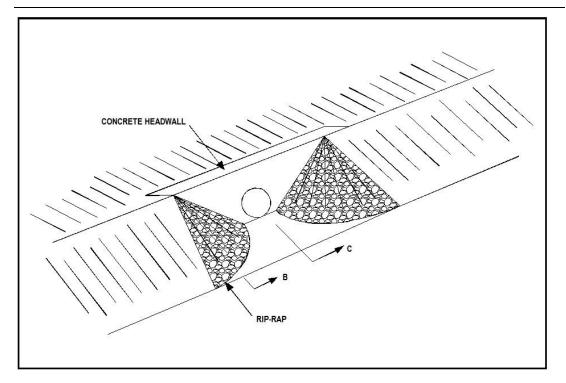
Concrete Headwall and Rip-Rap Embankment Protection
